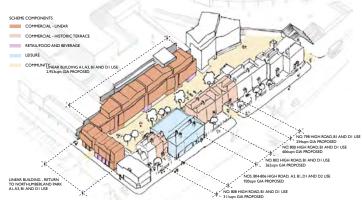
Northumberland Terrace Development (Source: Planning Application HGY/2020/1584)
